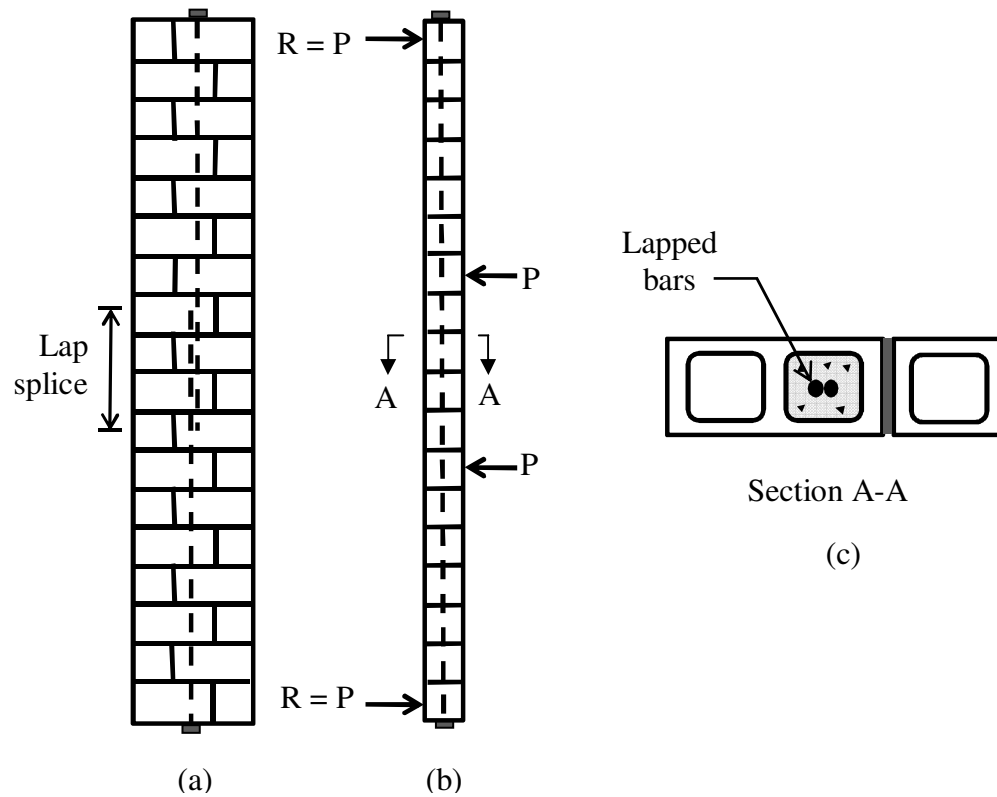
Full-scale wall tests by Uniat: (a) elevation, (b) side-view, and (c) cross-section (Uniat, 1983).
